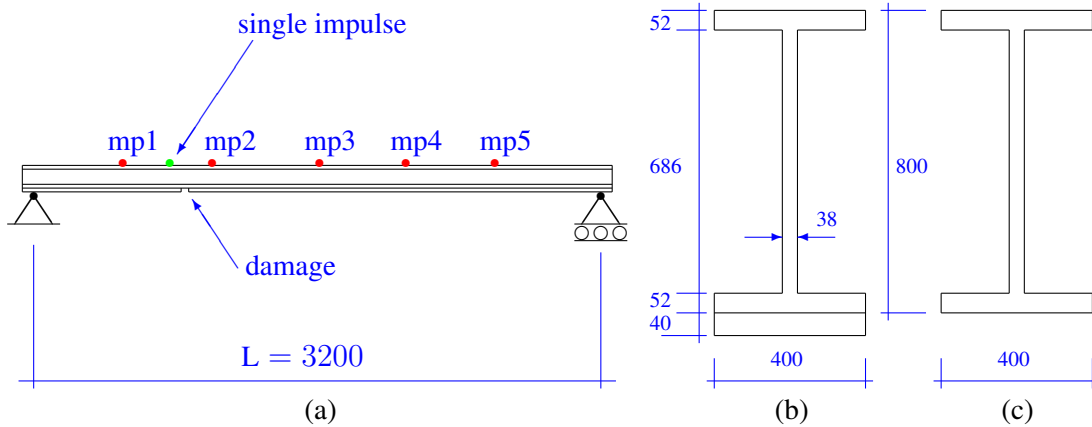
(a) Simple supported steel beam model, (b) Non-damaged section, (c) Damaged section.
